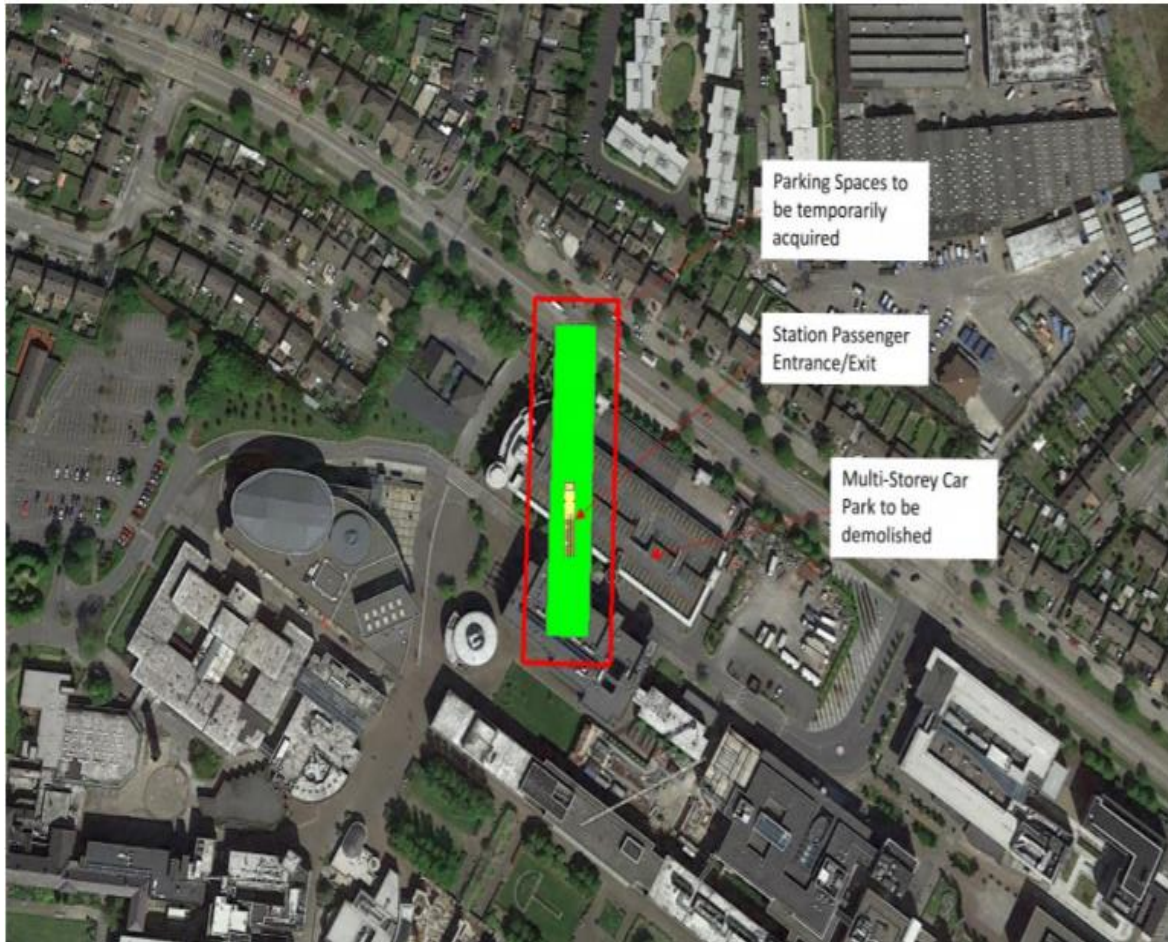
Metro North - DCU Ballymun Road (South Option) Location
